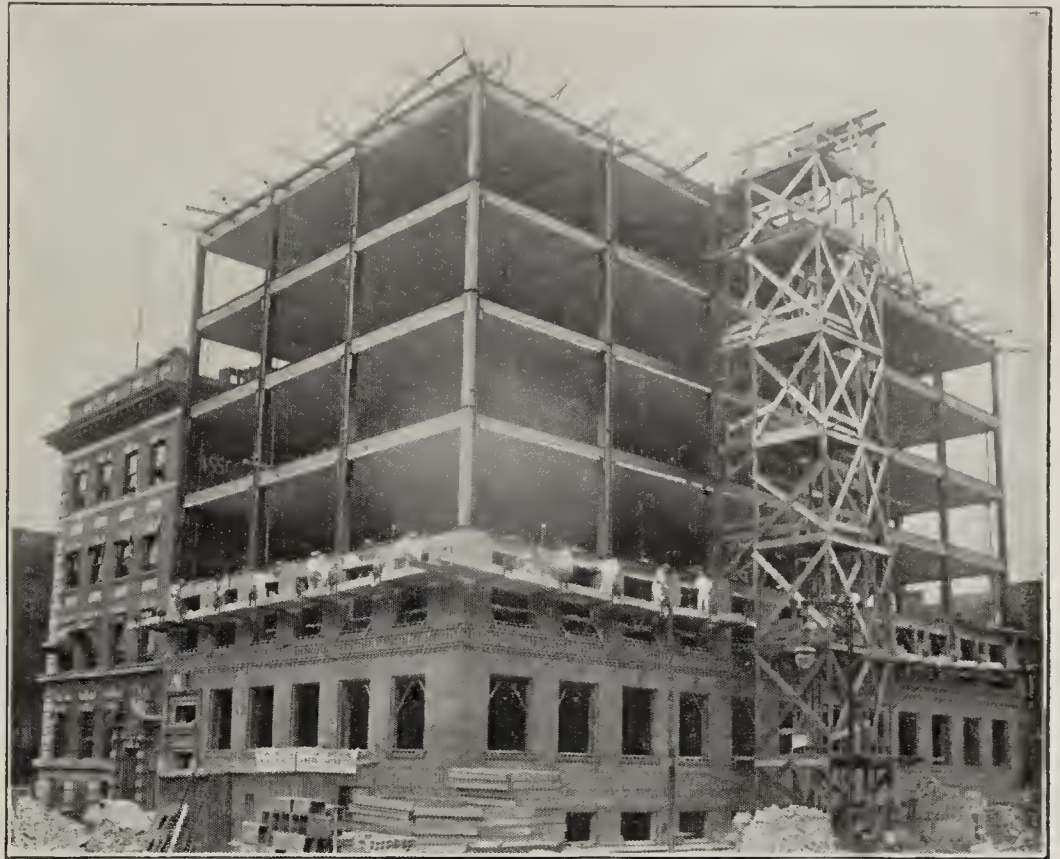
The completed steel work, the tile arches and the beginning brick work, giving an idea of what the future building will look like. (It will be noticed that the angle at which the camera was directed makes the building appear slightly on the bias. The reader is assured, however, that the architects are taking care to have the building erected on the square.)
